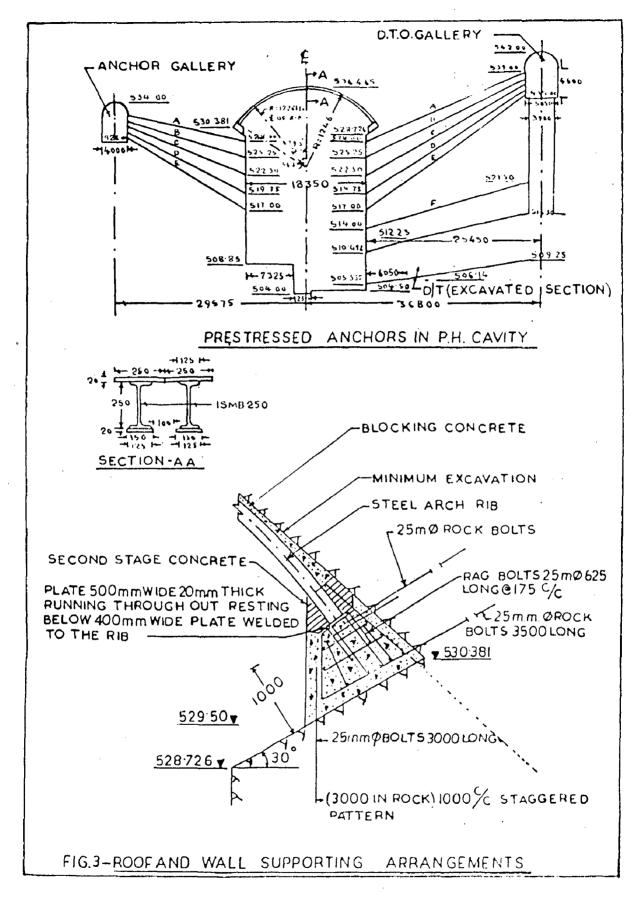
ROOF AND WALL SUPPORTS IN CHHIBRO POWER HOUSE
